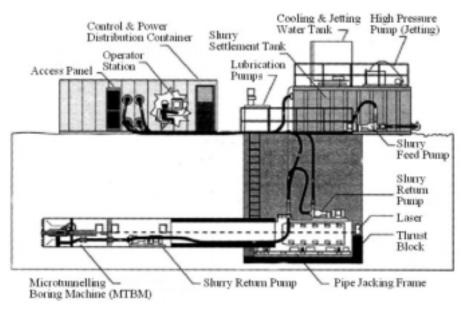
Typical Microtunneling Setup.⁽¹⁷⁾
